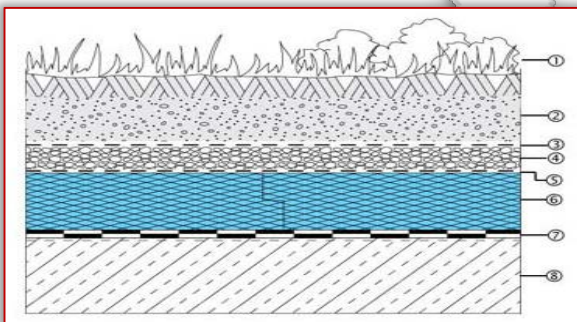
Intensive green roof: 1) vegetation; 2) drainage soil layer 200 mm thick; 3) separation/filtration layer; 4) drainage layer; 5) fabric (e.g. polypropylene) 110-140 g/m²; 6) insulation material; 7) bituminous waterproofing sheet; 8) concrete ceiling
